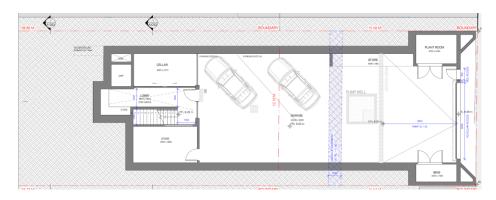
Originally proposed lower basement plan under the subject DA - 8 Victory Street, Clovelly (Source: BJB Architects Pty Ltd)
